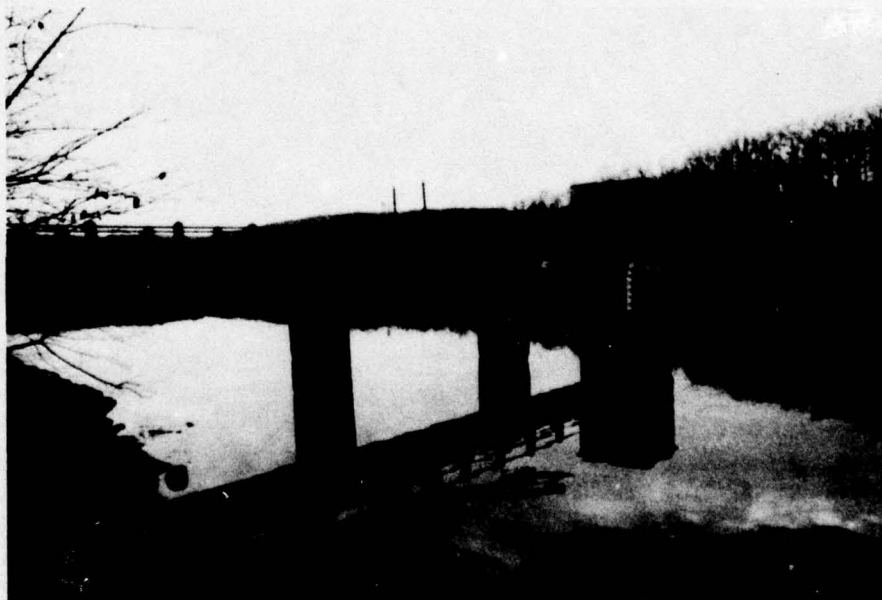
Gatehouse and staff gage near right bank of reservoir. (December 5, 1978)
